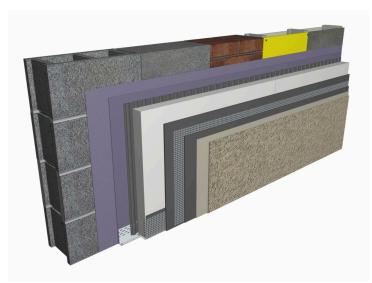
InsulROCK EIFS with Roller Bear and Prep Coat (or Prep Coat D) over masonry, concrete, brick, glass-fibre faced-gypsum board and cement board
